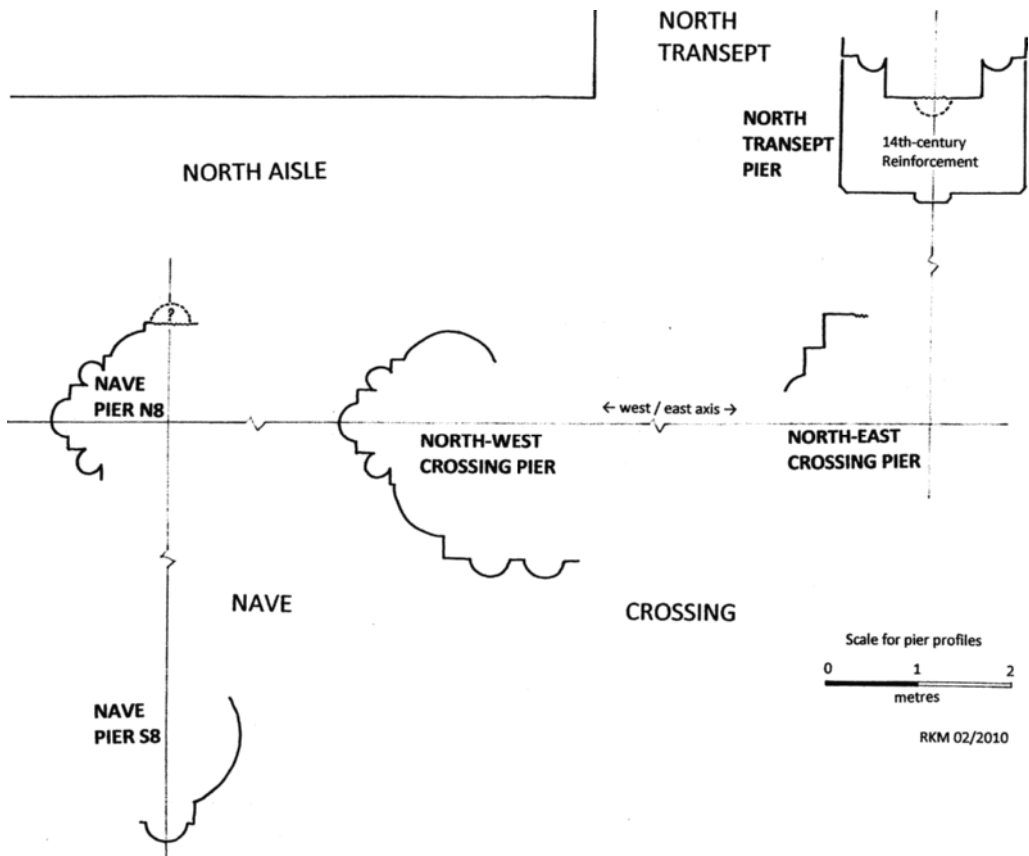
Coventry, Cathedral Church: profiles of excavated piers which retain worked stonework, in the north transept/crossing/east bay of the nave
